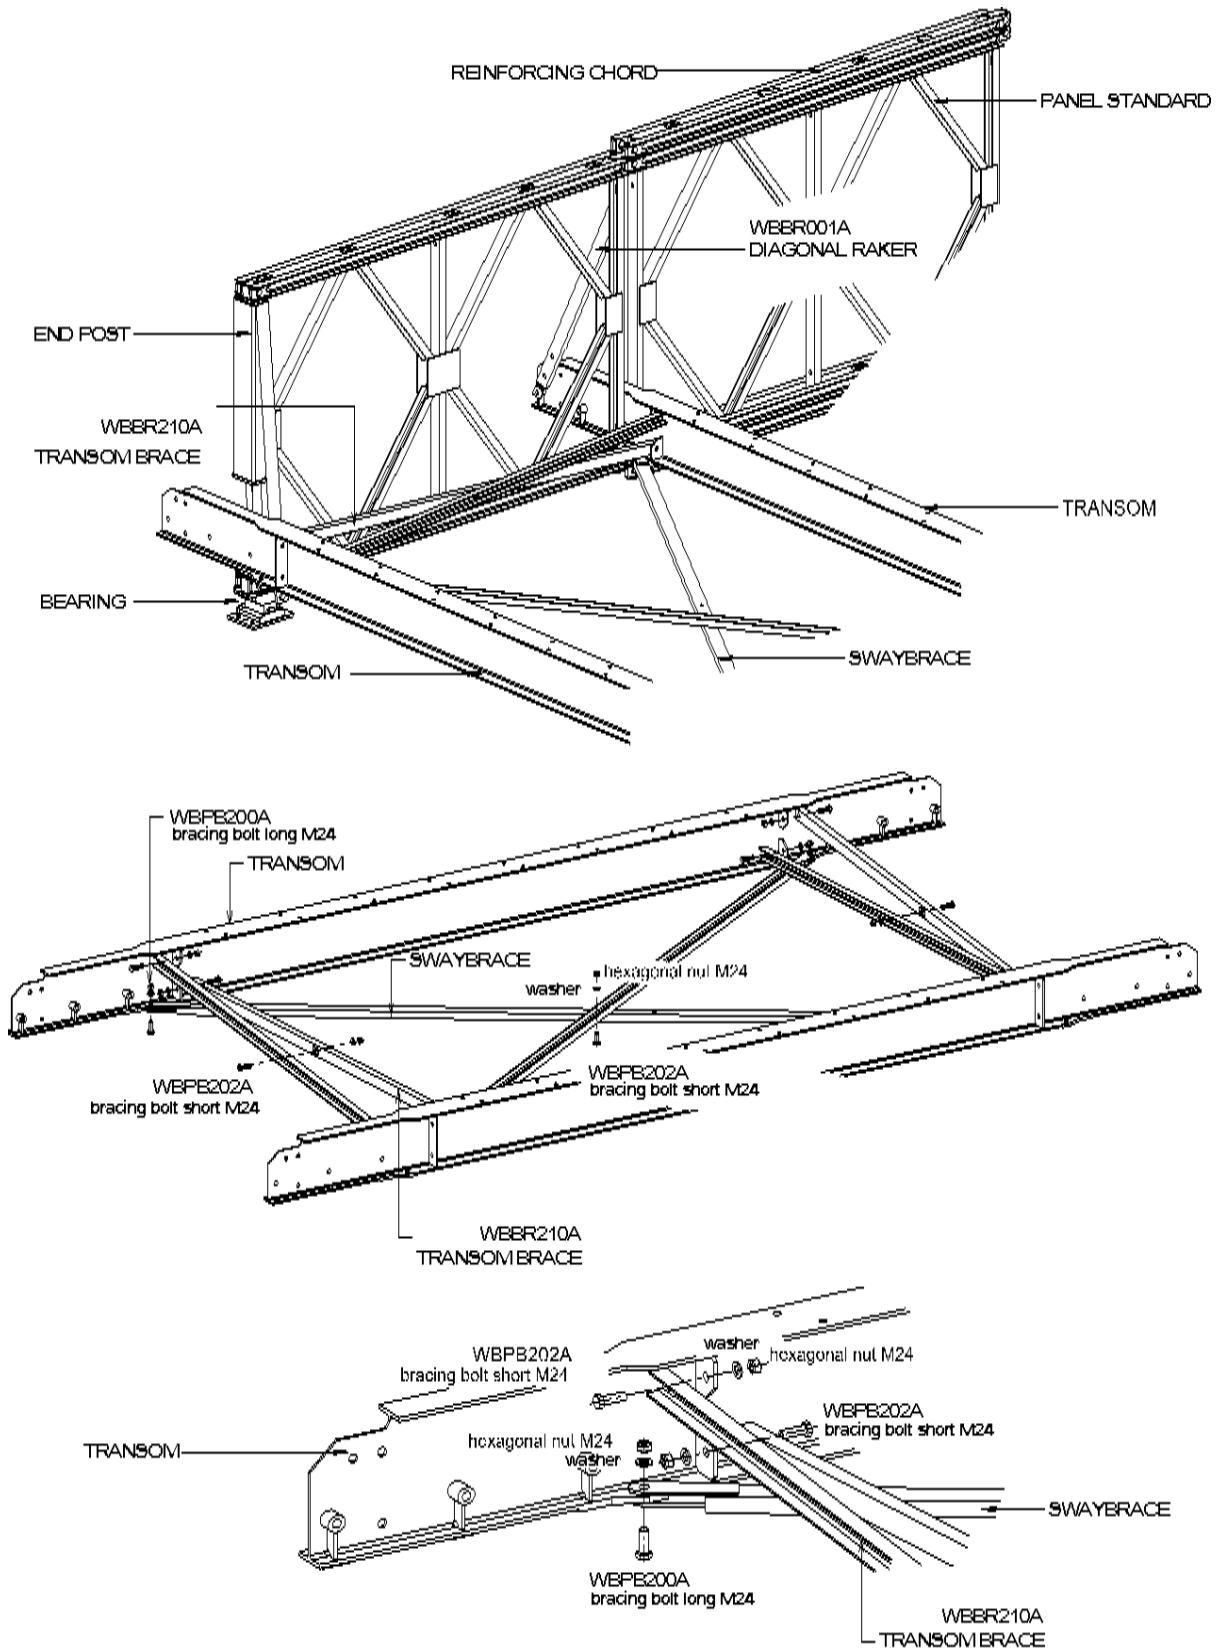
CONNECTION OF THE TRANSOM BRACE AND THE SWAY BRACE TO THE TRANSOM
